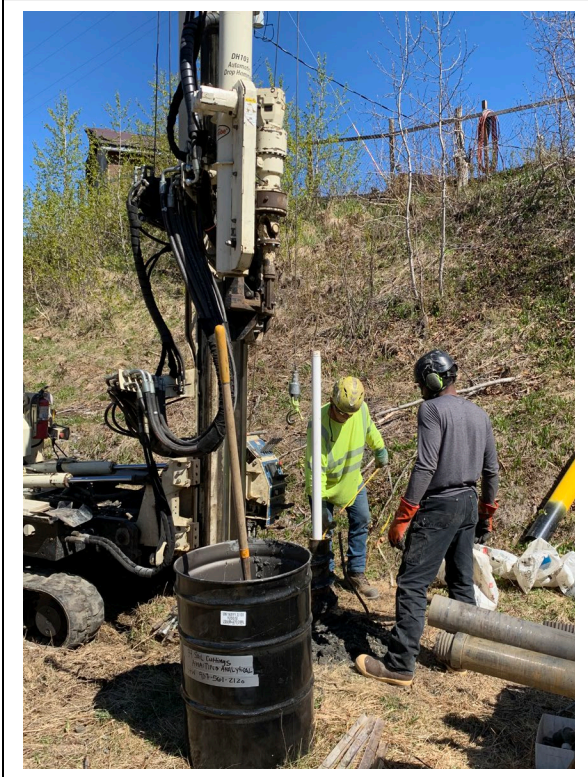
Looking north at the advancement of Boring B4. (May 24, 2021)
